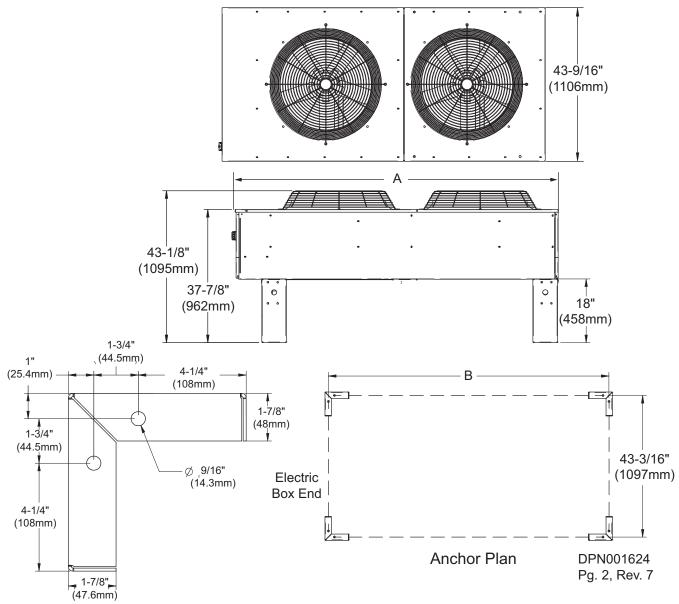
Cabinet and anchor dimensions, R-410A VFD control fin/tube condensers
